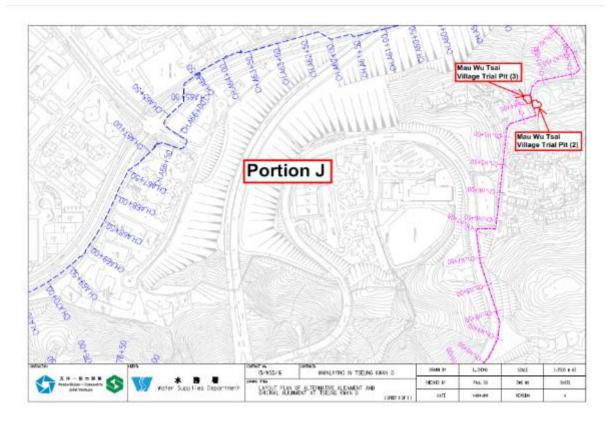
Location Plan for Mau Wu Tsai 2 & 3
